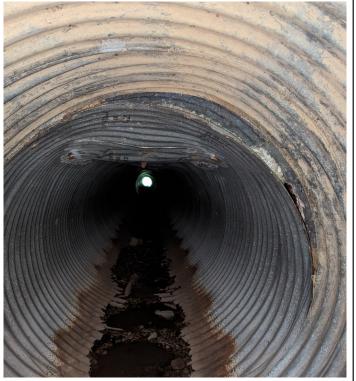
View of Large Deformations at North Barrel Obvert (Typ.)
